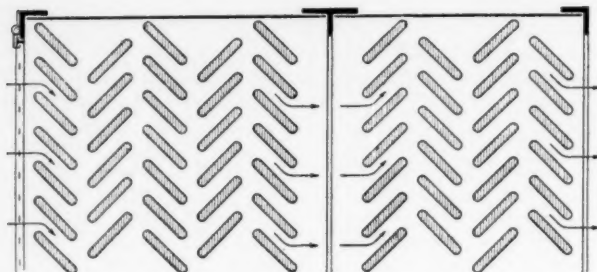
BALCKE AIR FILTER (SECTION THROUGH THE PLANKS)
